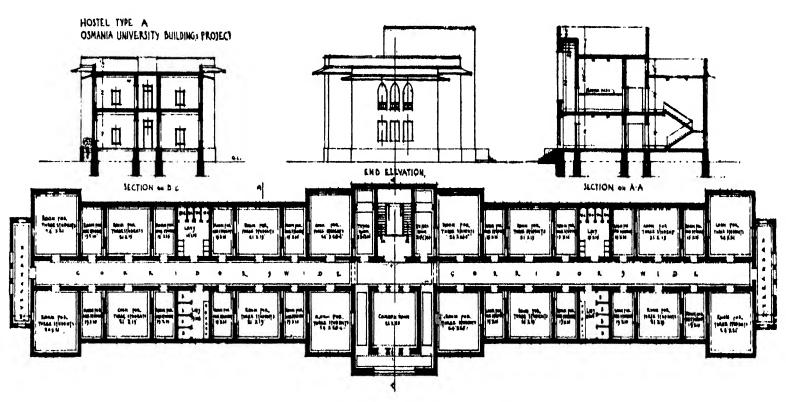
PLATE XXI --- Hostel A For 128 Students- End Elevations and First Floor.
